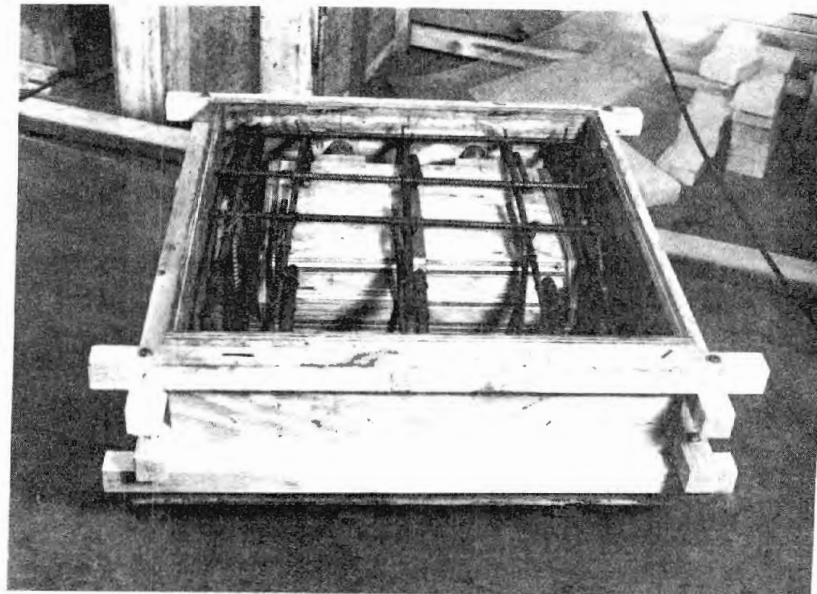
FORM USED FOR THE JOINT SPECIMENS
